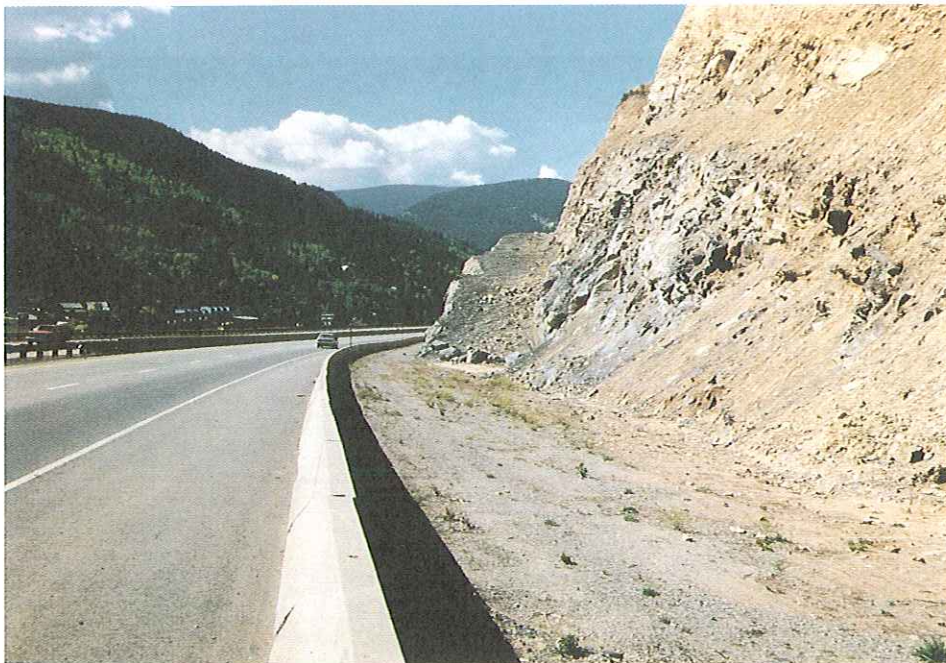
Jersey barrier along the outside shoulder to catch rolling rock.
